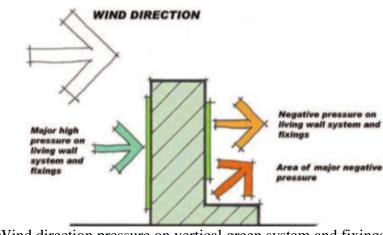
Wind direction pressure on vertical green system and fixings (Author, 2016)
